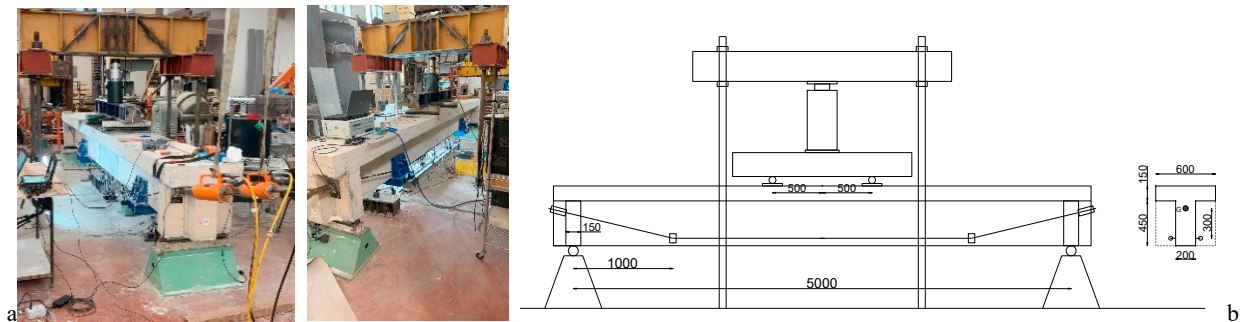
Experimental test on prestressed beam. a) General views during prestressing phase. b) Bending test setup
